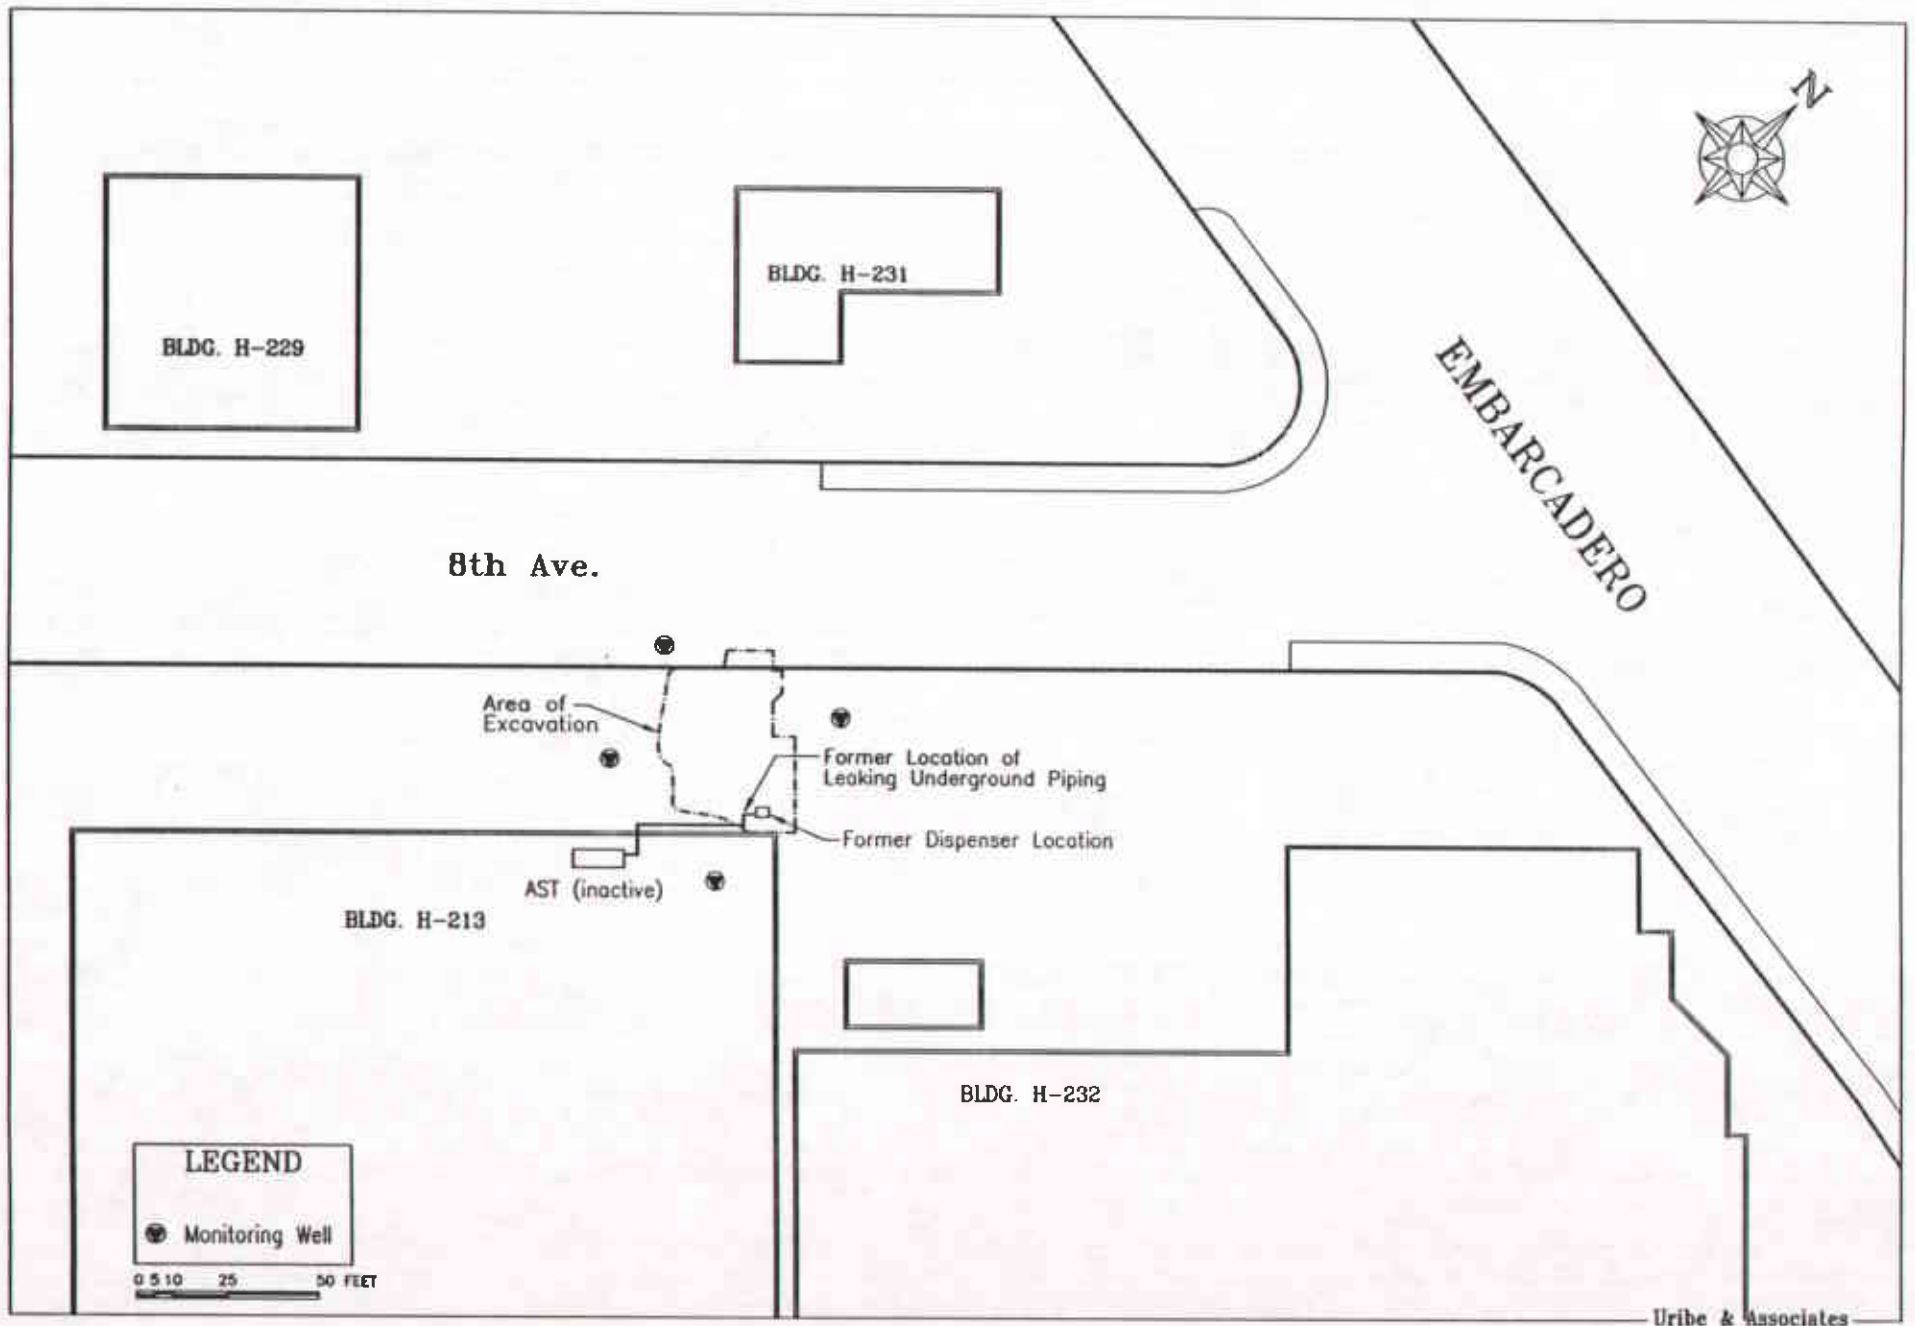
Site Plan Showing Proposed Monitoring Well Locations
